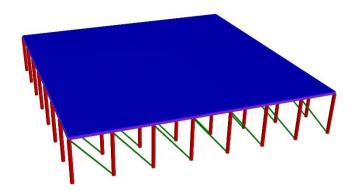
Birds eye perspective of the pier structure above sea bed. Units in meters.
